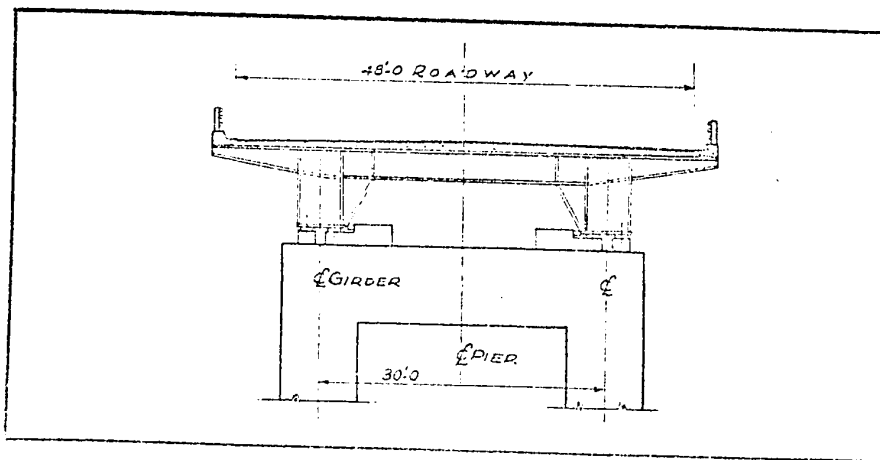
TYPICAL CROSS SECTION OF THE APPROACH SPAN
